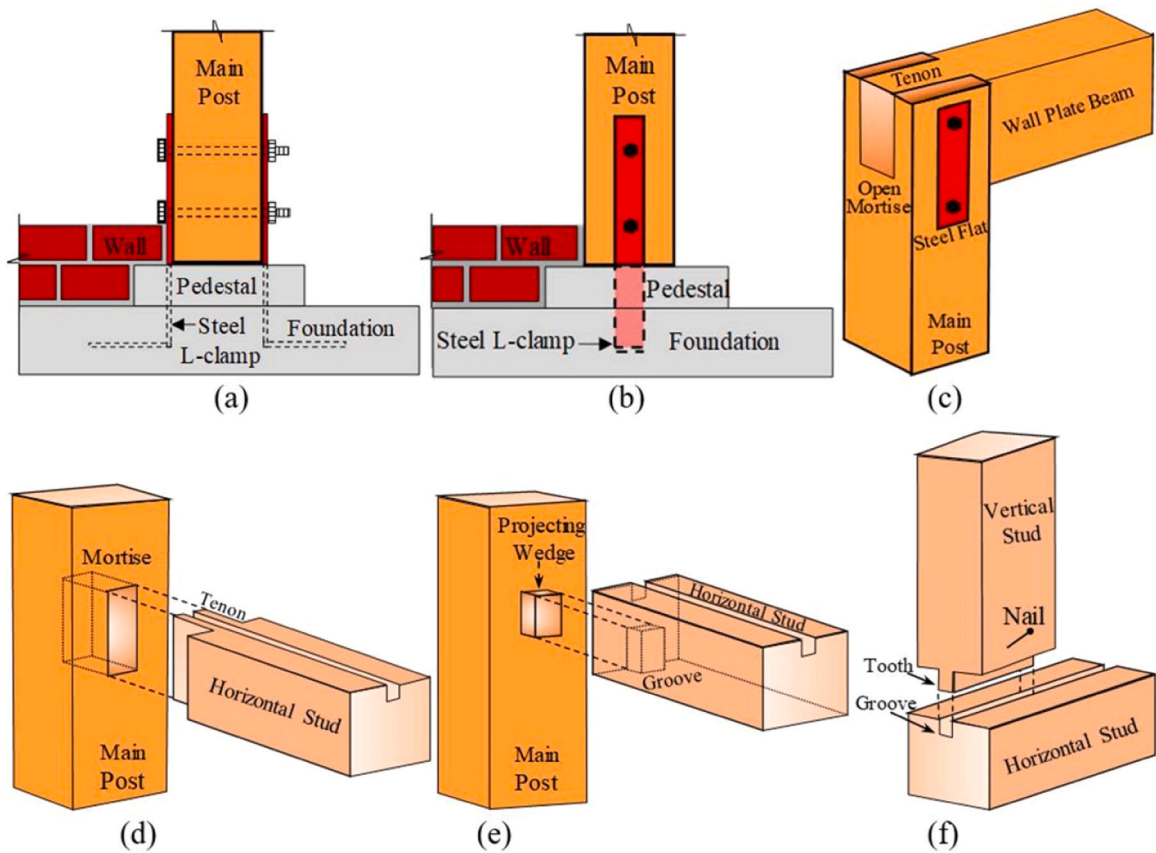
Details of joints used in typical Assam-type houses: (a) Joint A, (b) Joint B, (c) Joint C, (d) Joint D, (e) Joint E, and (f) Joint F [9].
